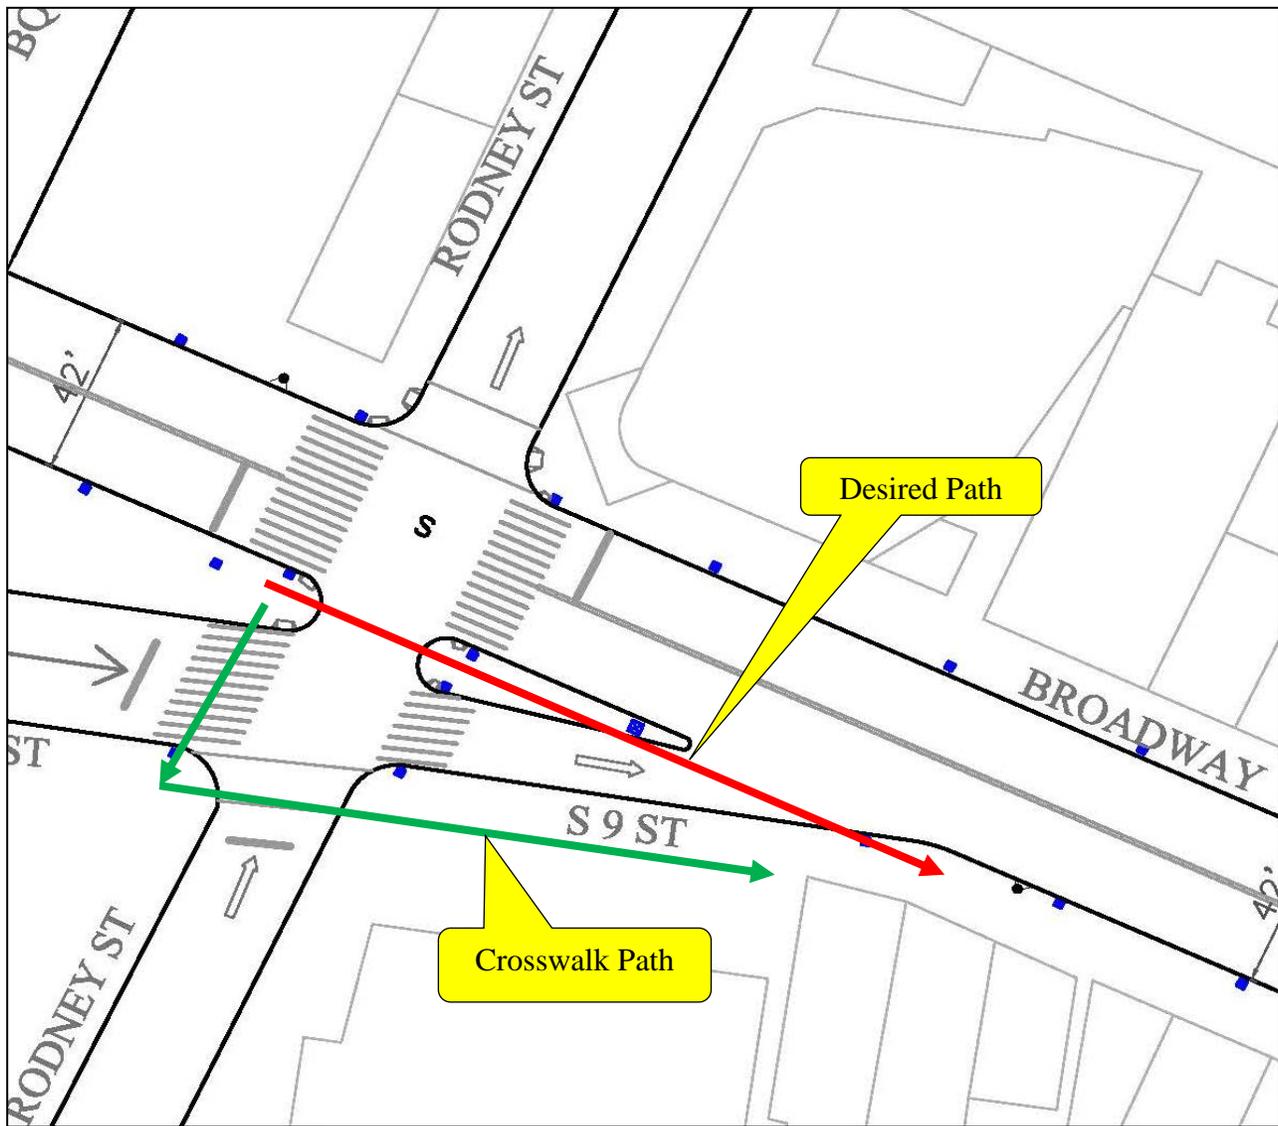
Broadway, Rodney Street and South 9th Street Existing Conditions
